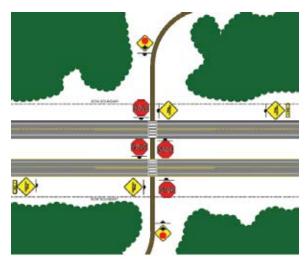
Example Signage Plan for Trail Crossing Mid-Block of Multilane Roadway (Alberta Transportation)
